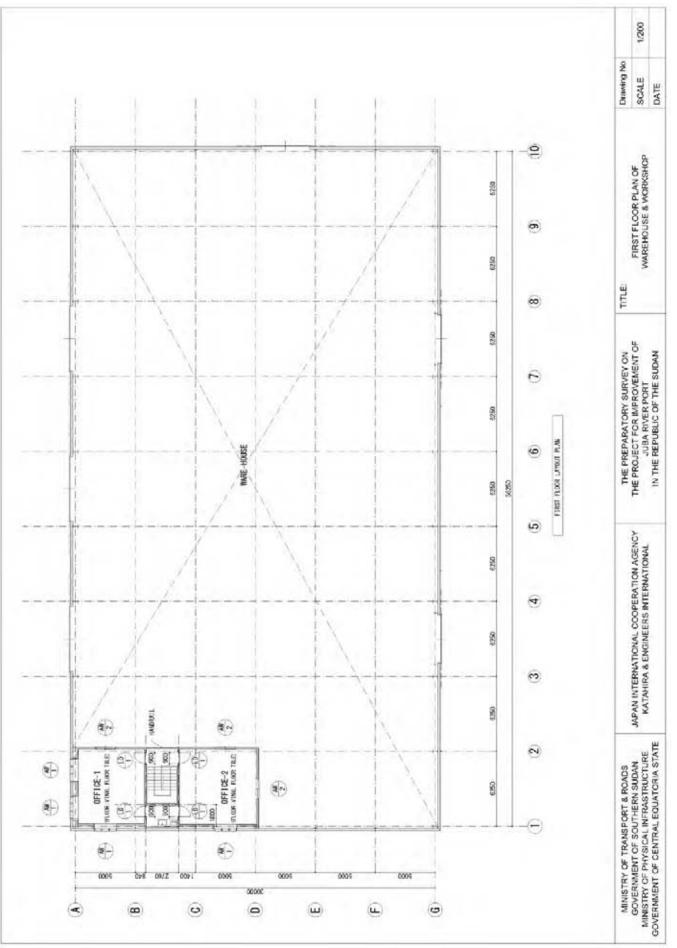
First Floor Plan of Warehouse & Repair Shop
